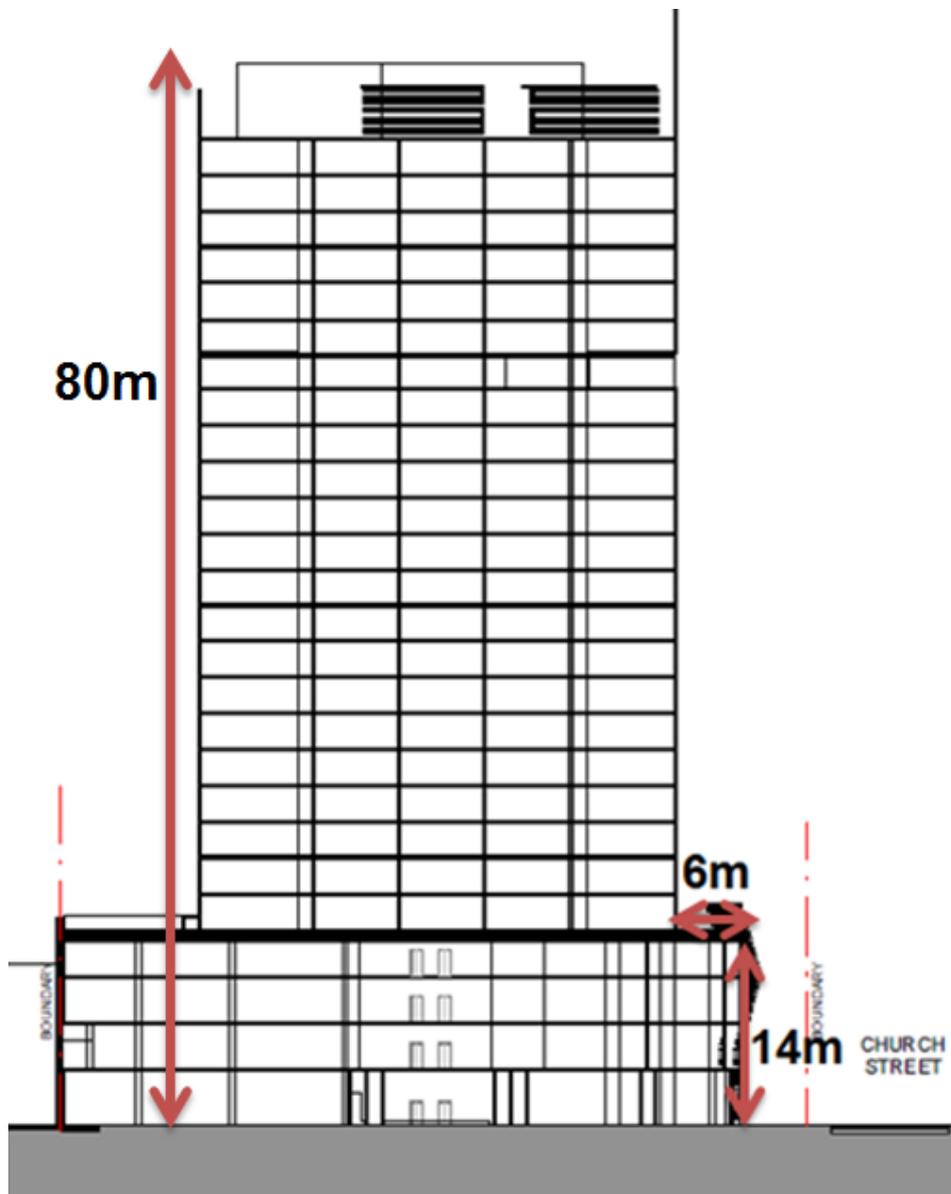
Development concept (Source: Applicant's Urban Design Report)
